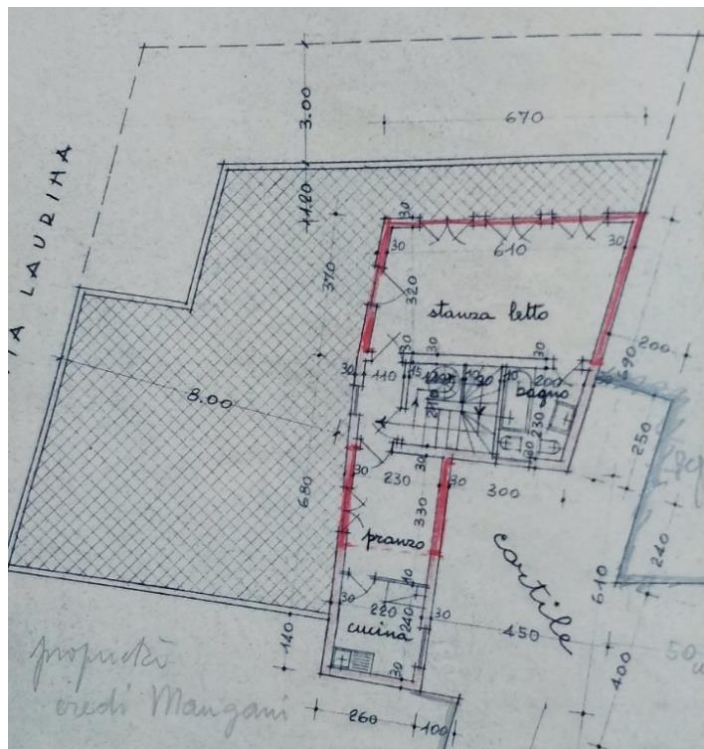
Marta Lonzi's sketch of the renovated plan of the terrace floor, Accardi's house, Rome.
